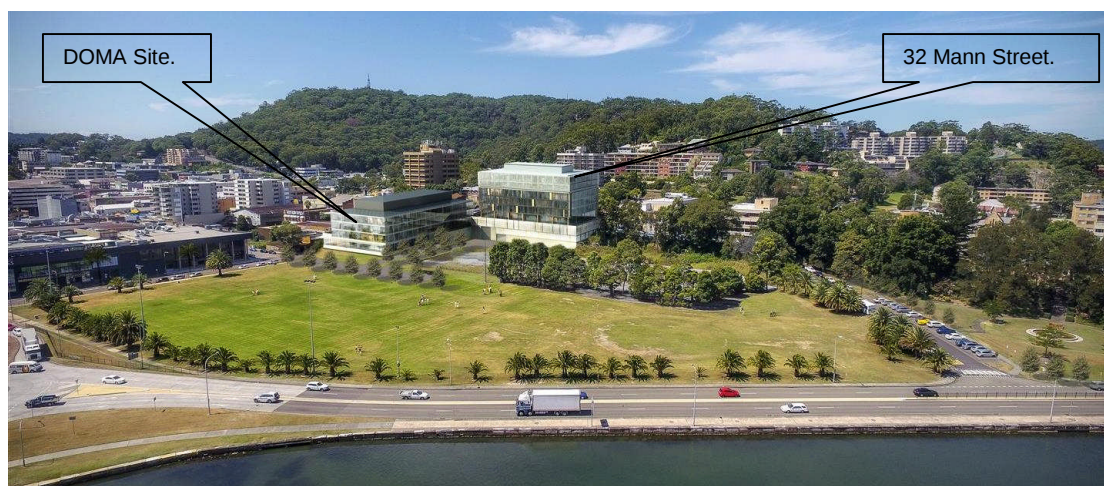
Concept photomontage of the development adjacent to the DOMA Site. (Source - Group GSA)
